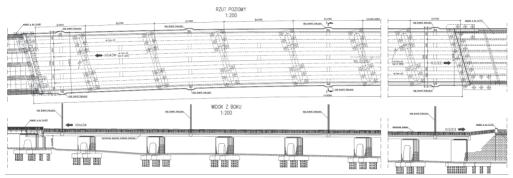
Scope of modernization of the railway line between Kraków Główny Railway Station and the Vistula River: site plan – stage III [13]
